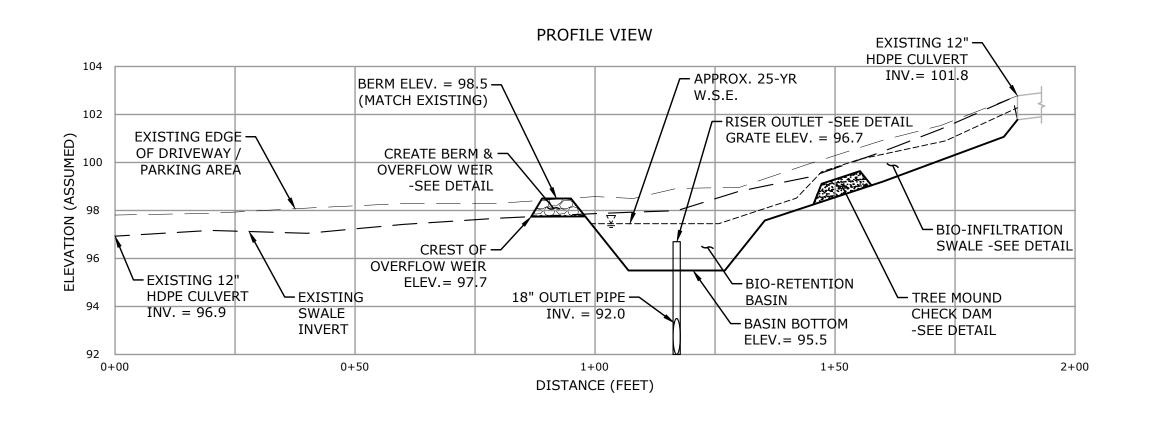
Water collected in the bio-retention area could overflow to an existing pond used to supply irrigation to the site.
